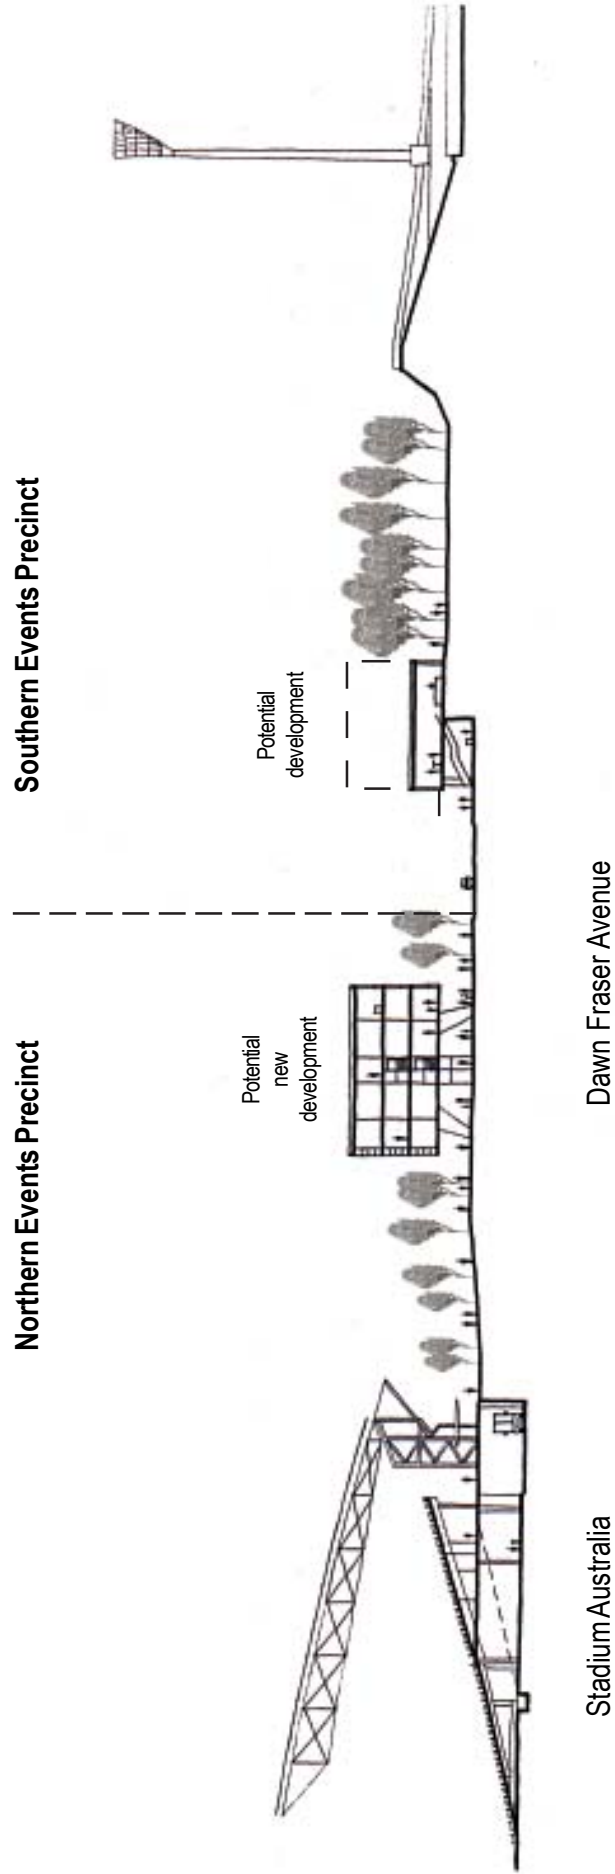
Indicative Cross Section through Dawn Fraser Avenue showing ground floor permeability of new development
